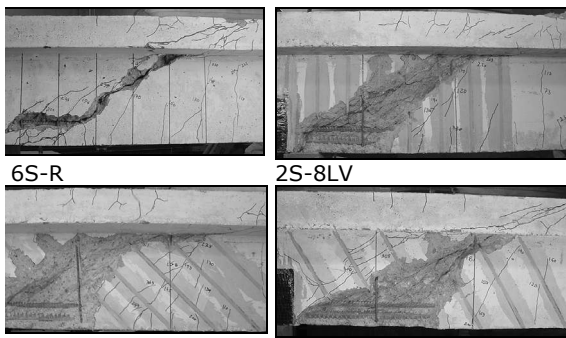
Details of the failure zone of one of the tested series of beams.
